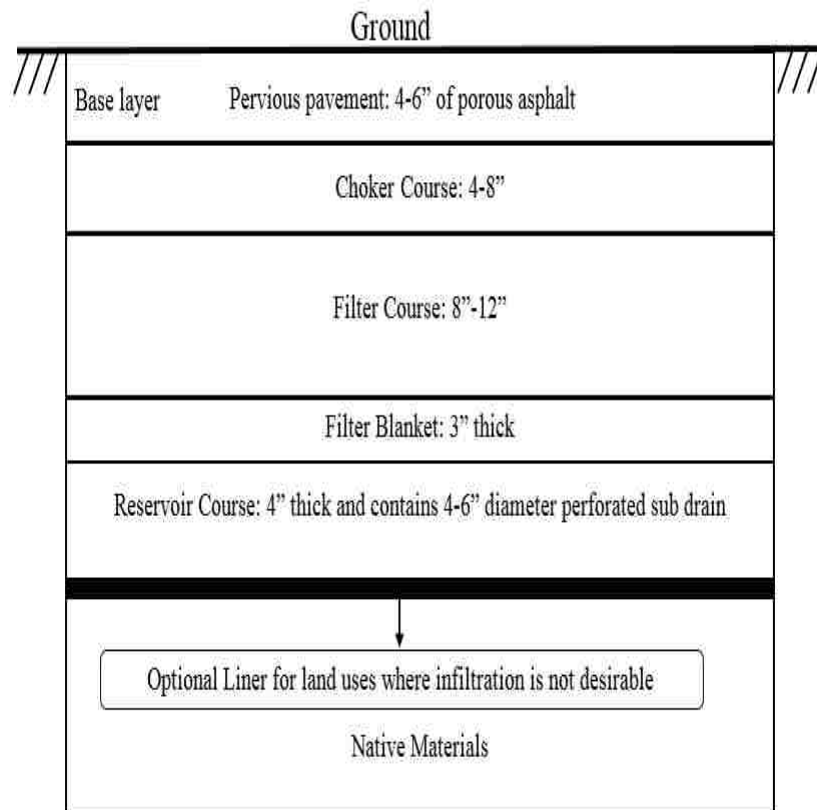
Typical cross section of porous pavement system in a parking area (modified from UNHSC, 2009)
